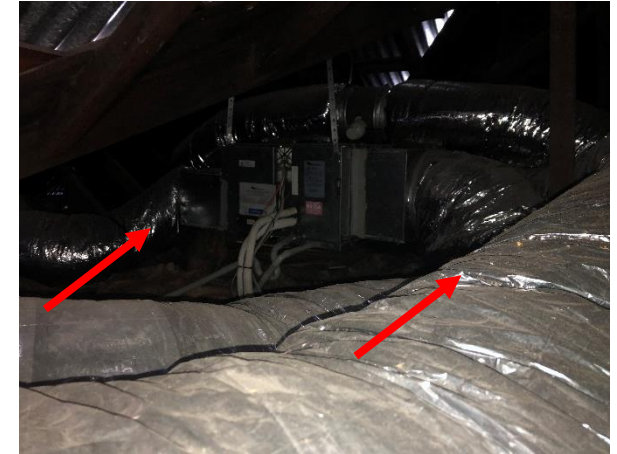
Cottage, assumed SMF insulation to the air conditioning ducting within the roof void
